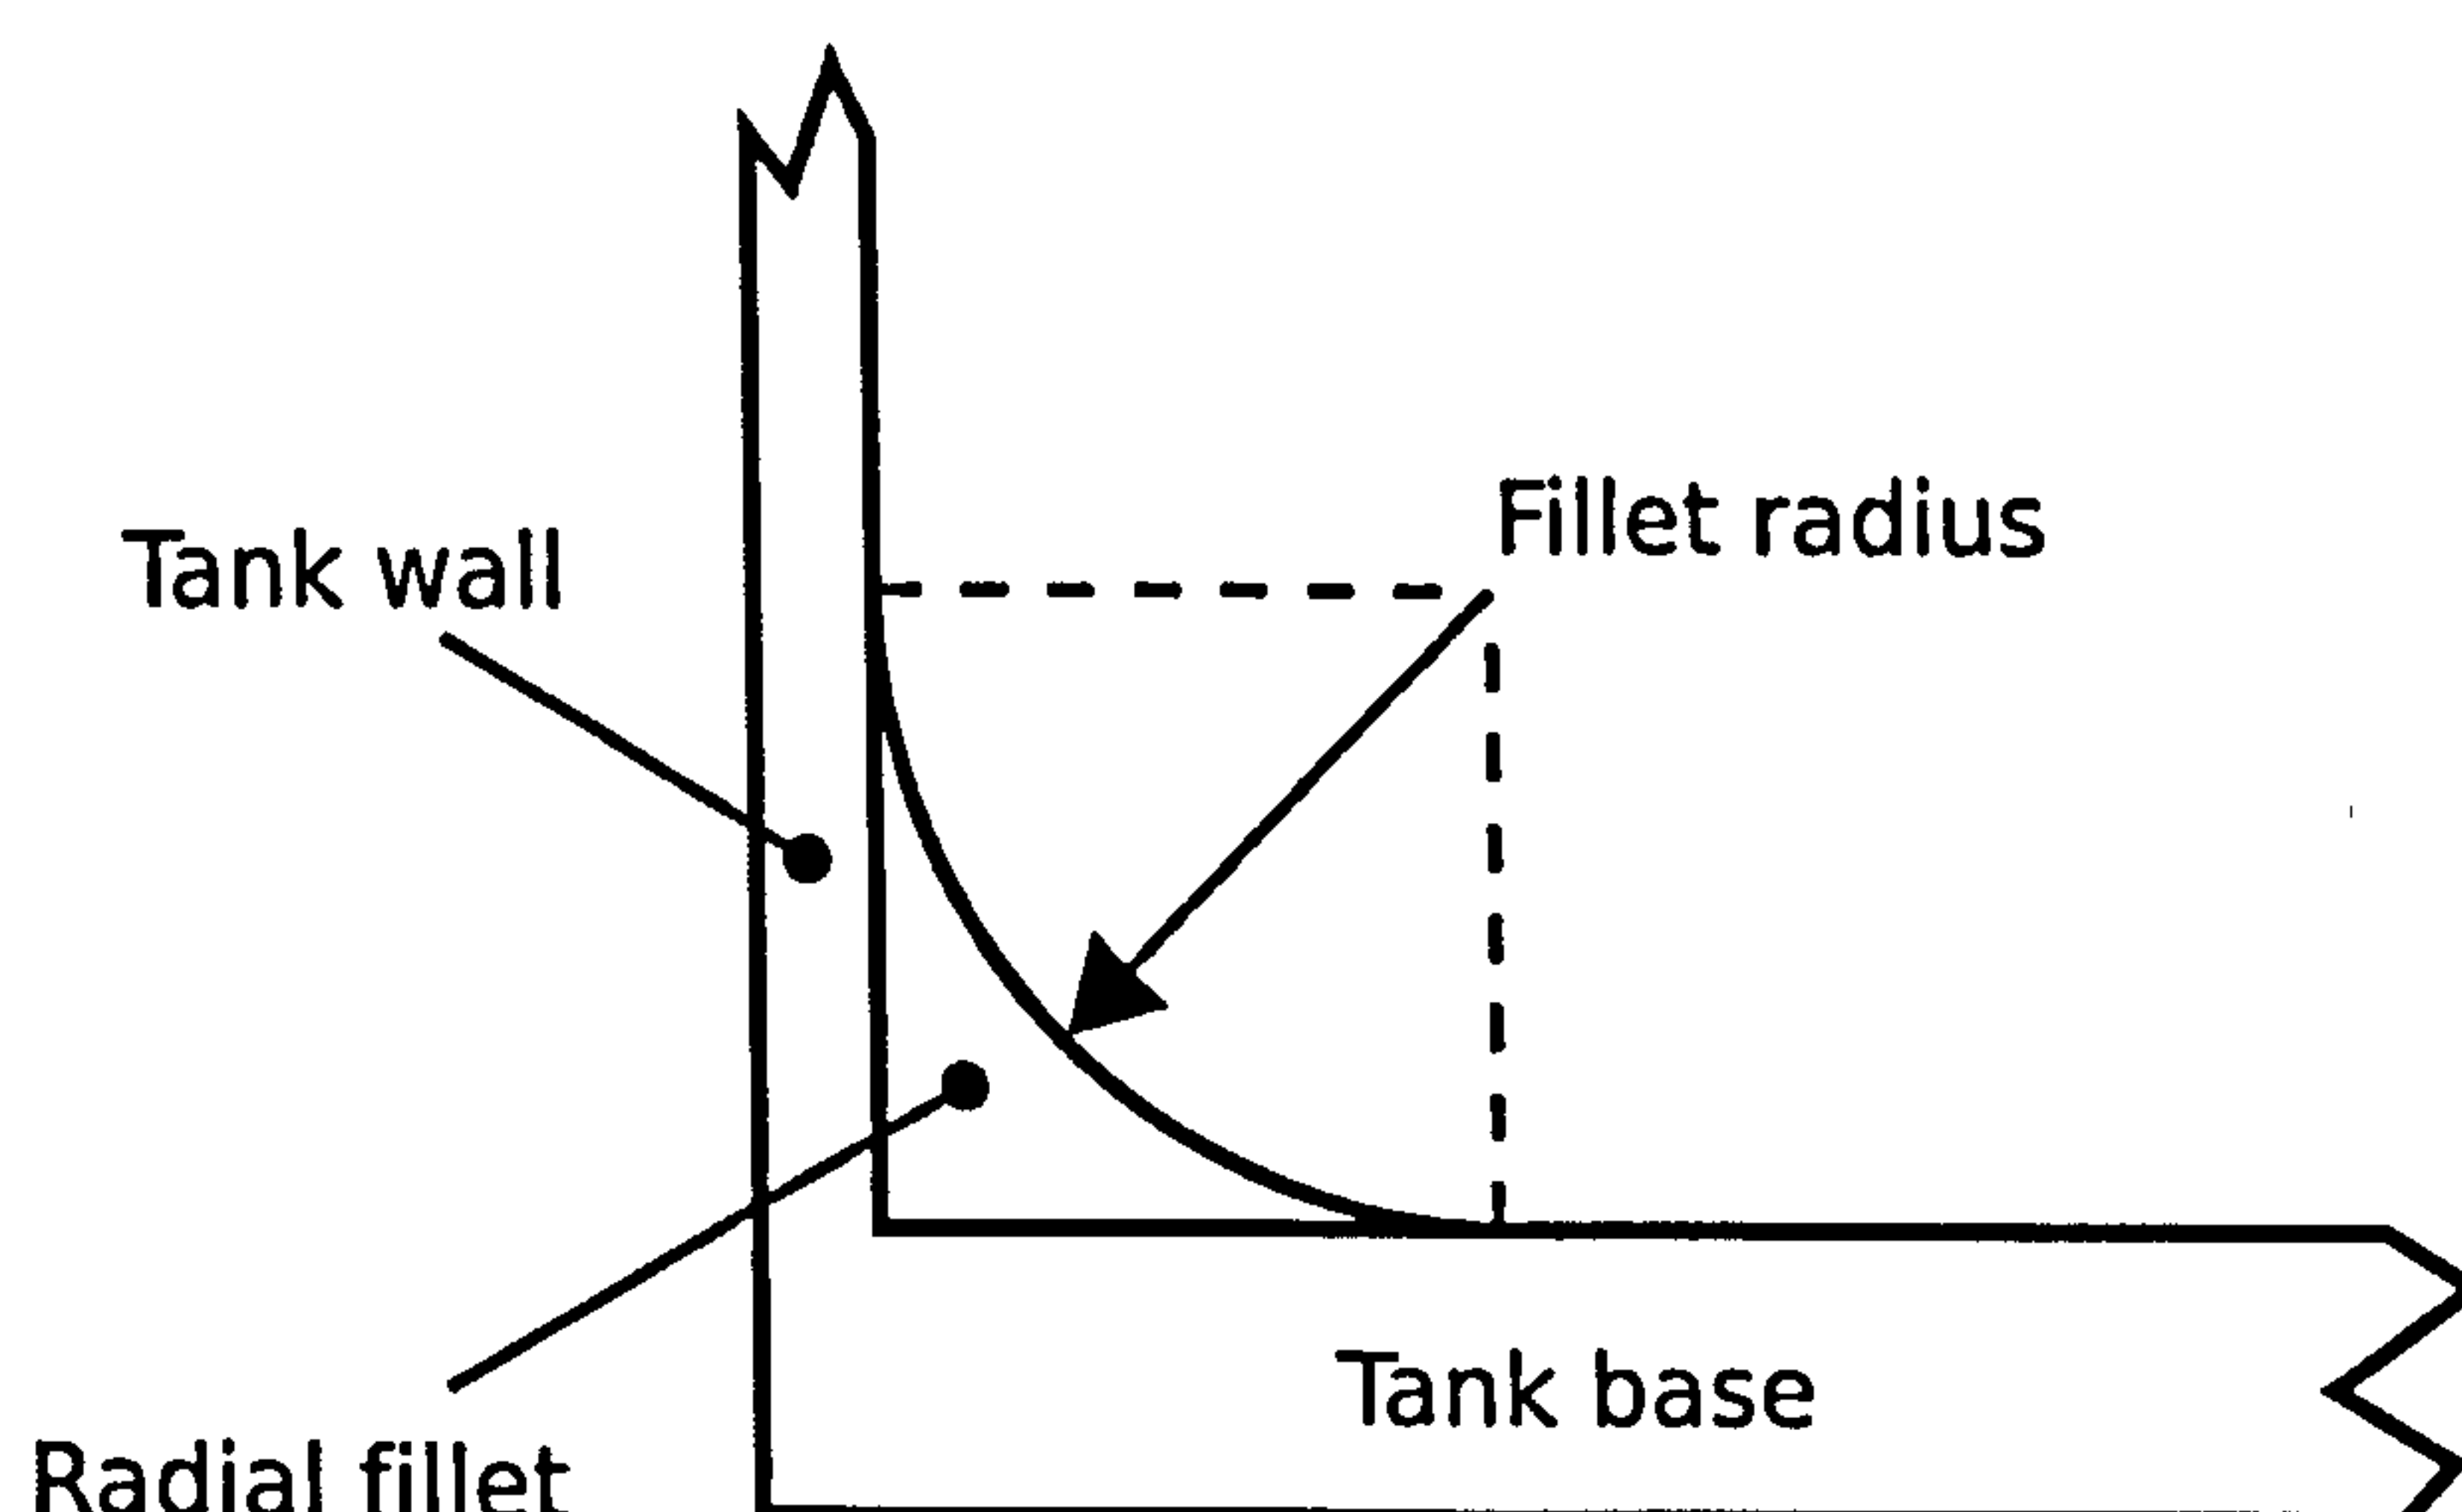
Cross section of wall-base joint of a cylindrical tank, showing radial fillet at joint
